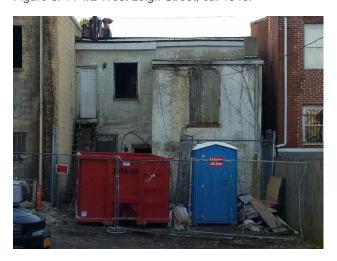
14 1/2 West Leigh Street, rear elevation, current conditions.
